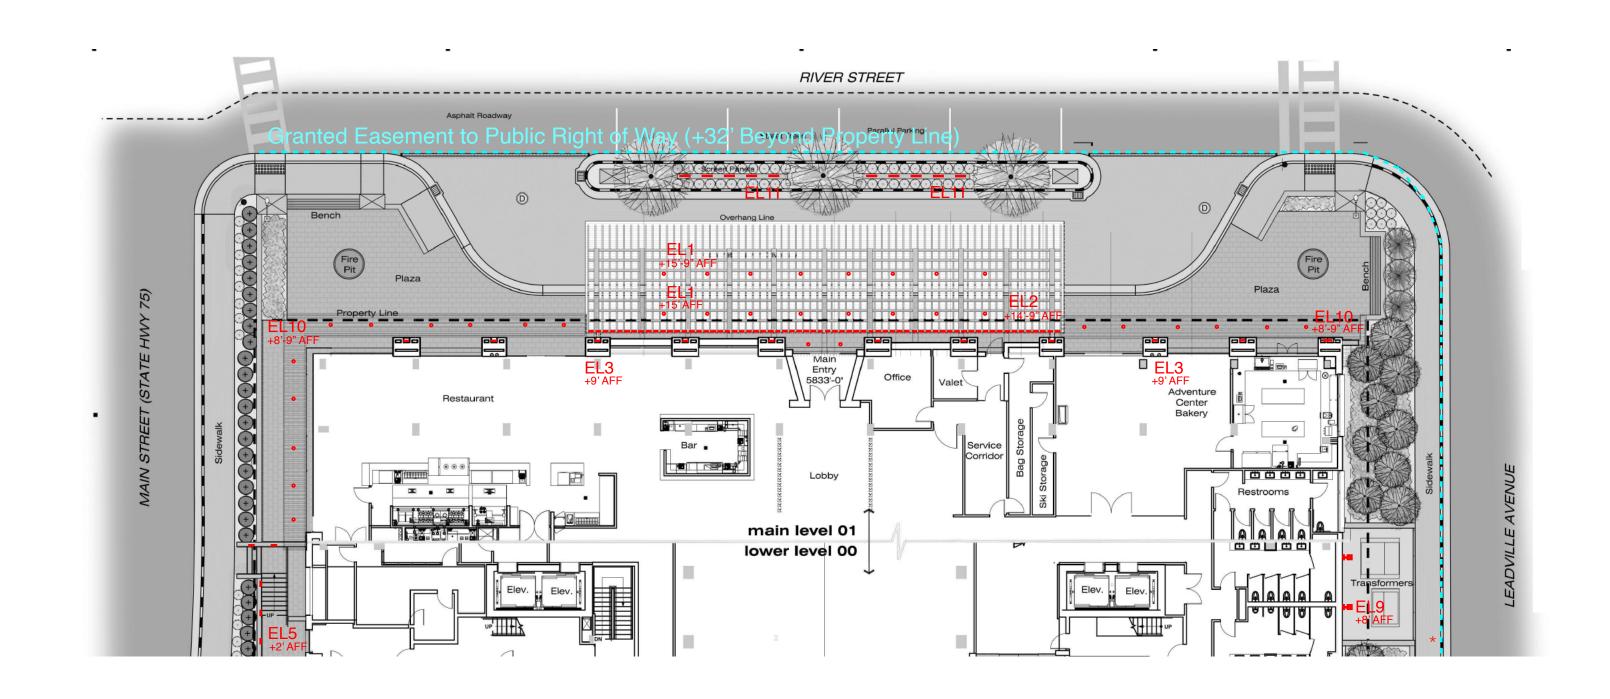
EXHIBIT B: Appellation Hotel Approved Exterior Lighting Plans
